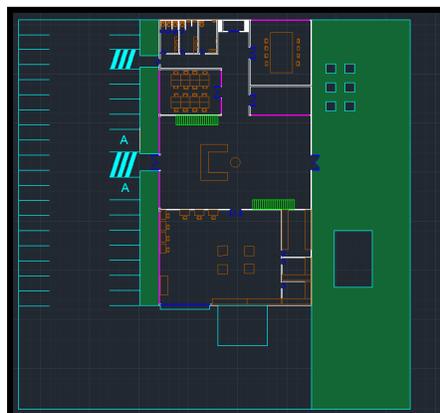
First floor of building, including multipurpose workspace, foyer, shared workspace, boardroom, elevator, bathrooms, parking lot and outdoor space.
